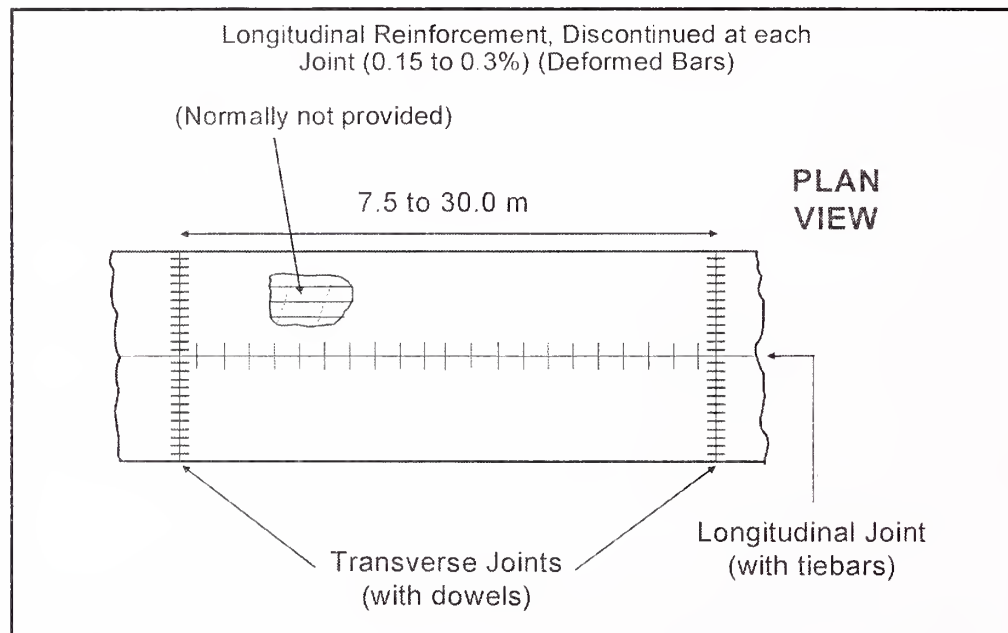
Jointed Reinforced Concrete Pavement (JRCP)
